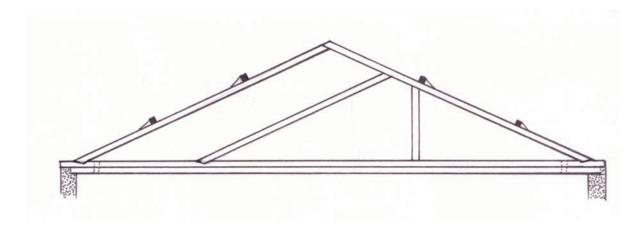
Indicative Drawing, not to scale, of the roof truss construction of
